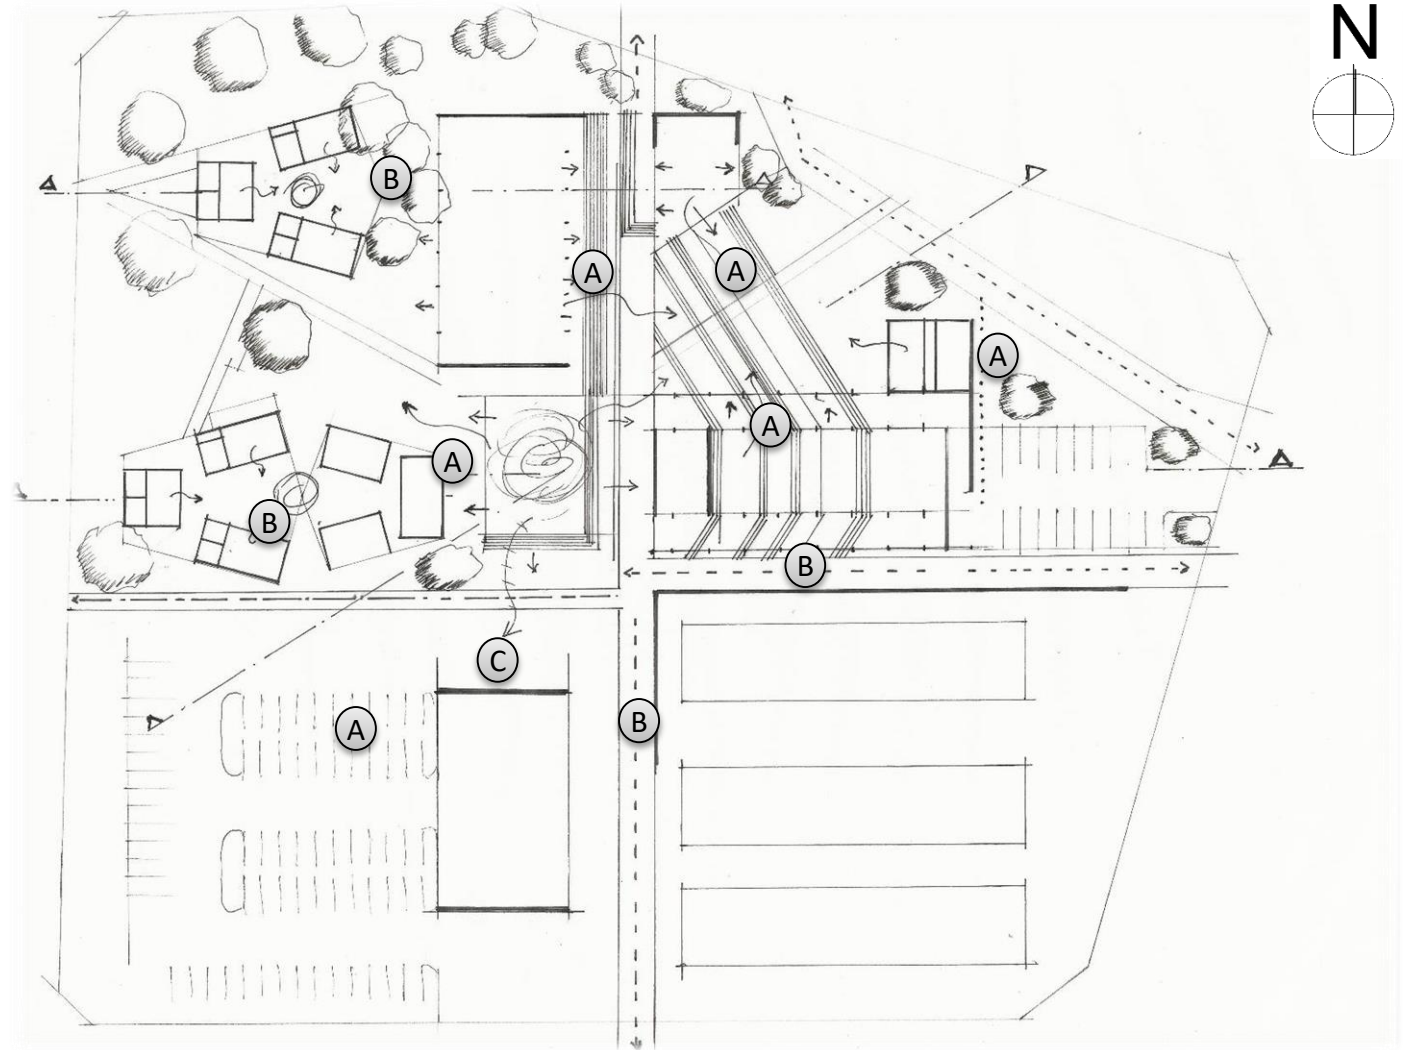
Hierarchy: Planning of open and closed facilities.(NTS) (Author 2021).
